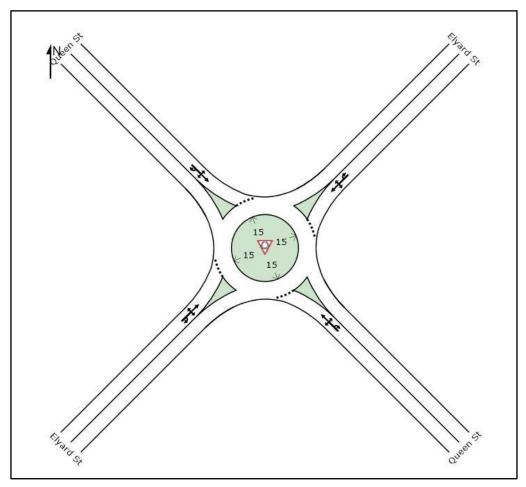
Queen Street / Elyard Street Intersection Layout
